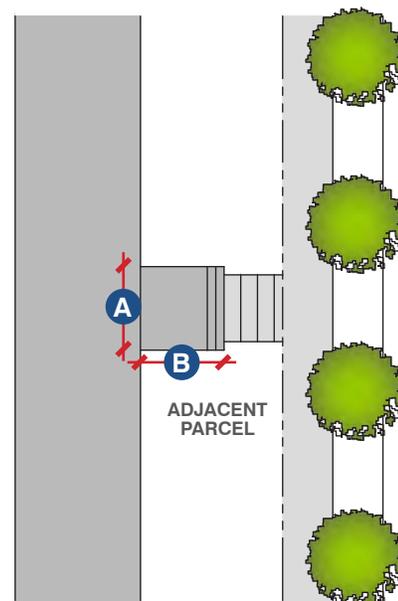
FIGURE: DOORYARD FRONTAGE PLAN VIEW DIAGRAM
